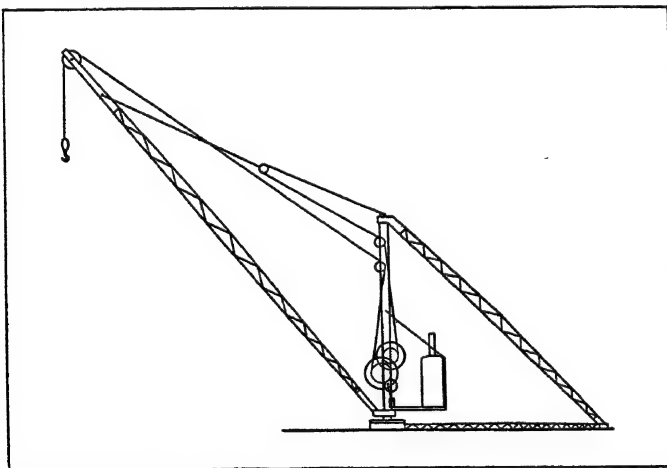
THE SCOTCH DERRICK, A STATIONARY STEAM (OR ELECTRIC) CRANE, WITH LIMITED ROTATING MOVEMENT, MUCH USED IN BUILDING CONSTRUCTION
